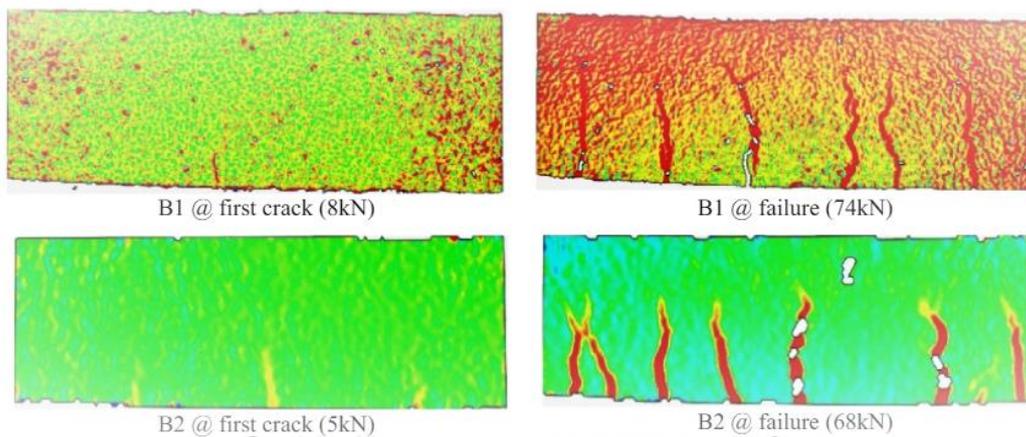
Development of cracks in both normal concrete beam (B1) and rubberized concrete Beam (B2) due to loading [28]
